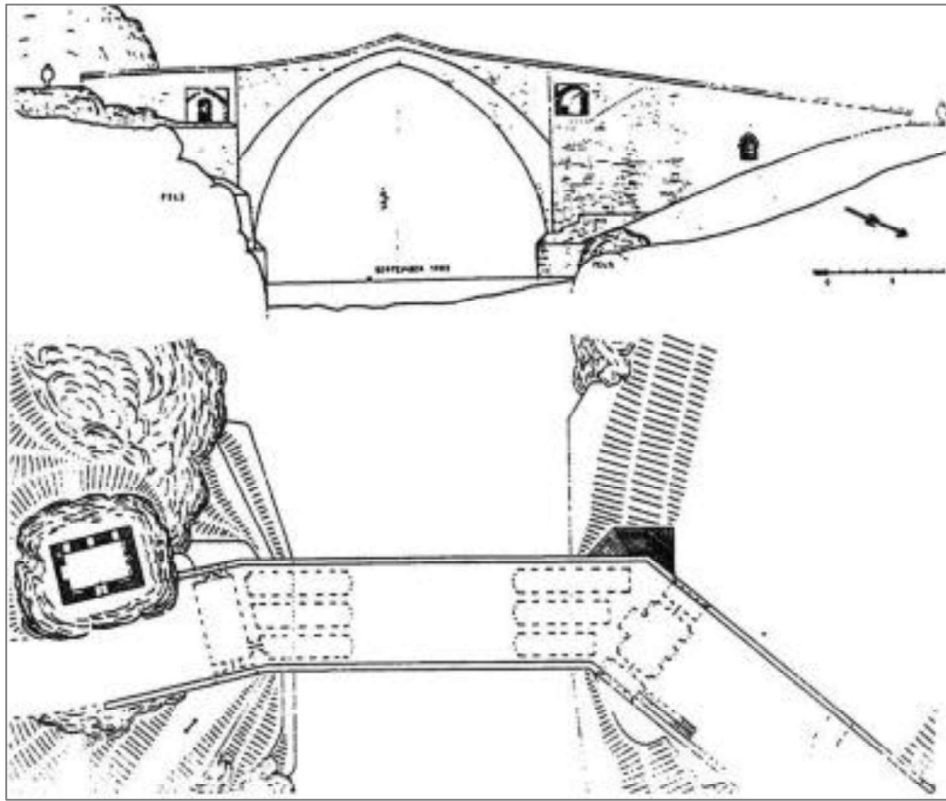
Anbooh bridge plan and facade, Farshidnik & Afhami, 2010
